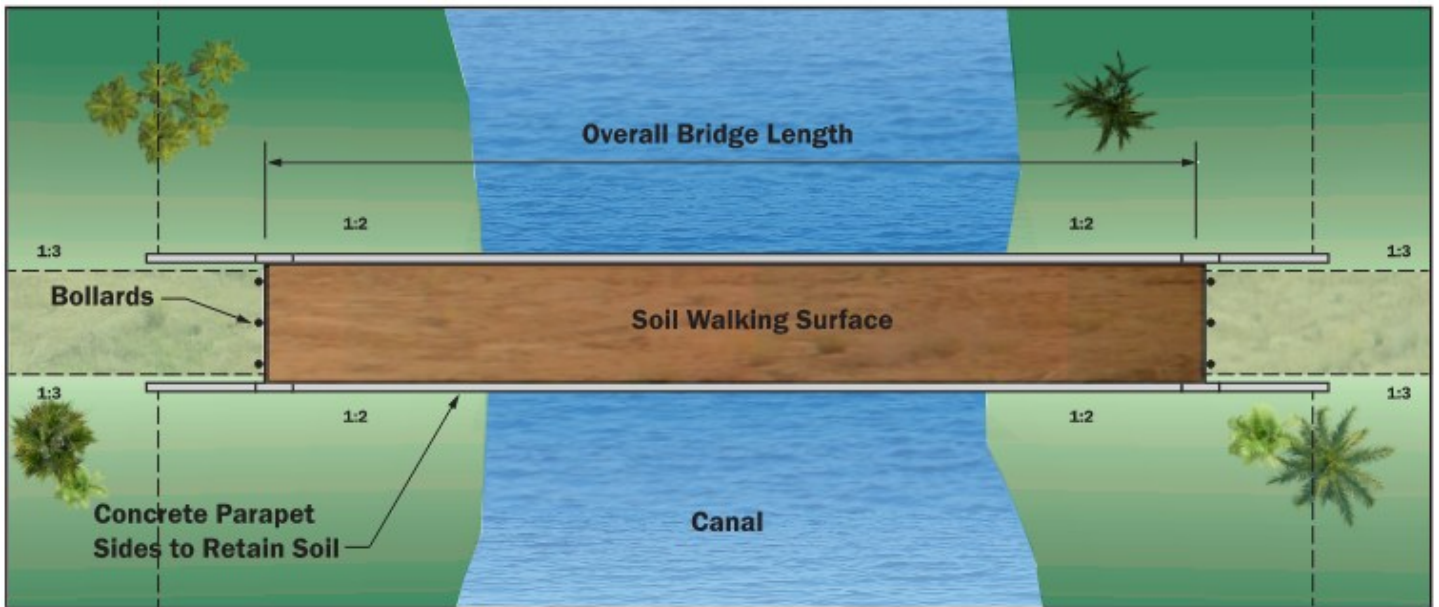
Plan view of a FIB design canal crossing with natural walking surface.
